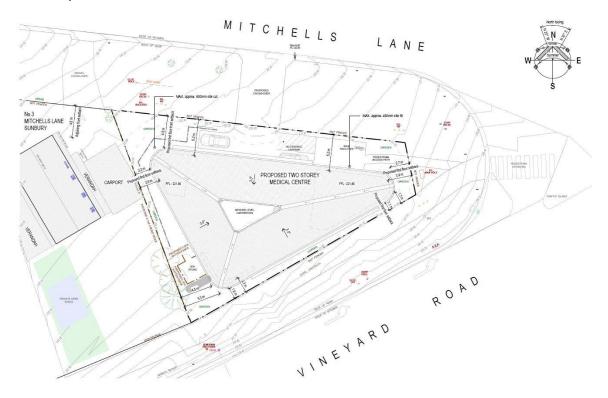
Proposed Site Plan (Sheet TP03 LEEMONdesign) – 1 Mitchells Lane, Sunbury
